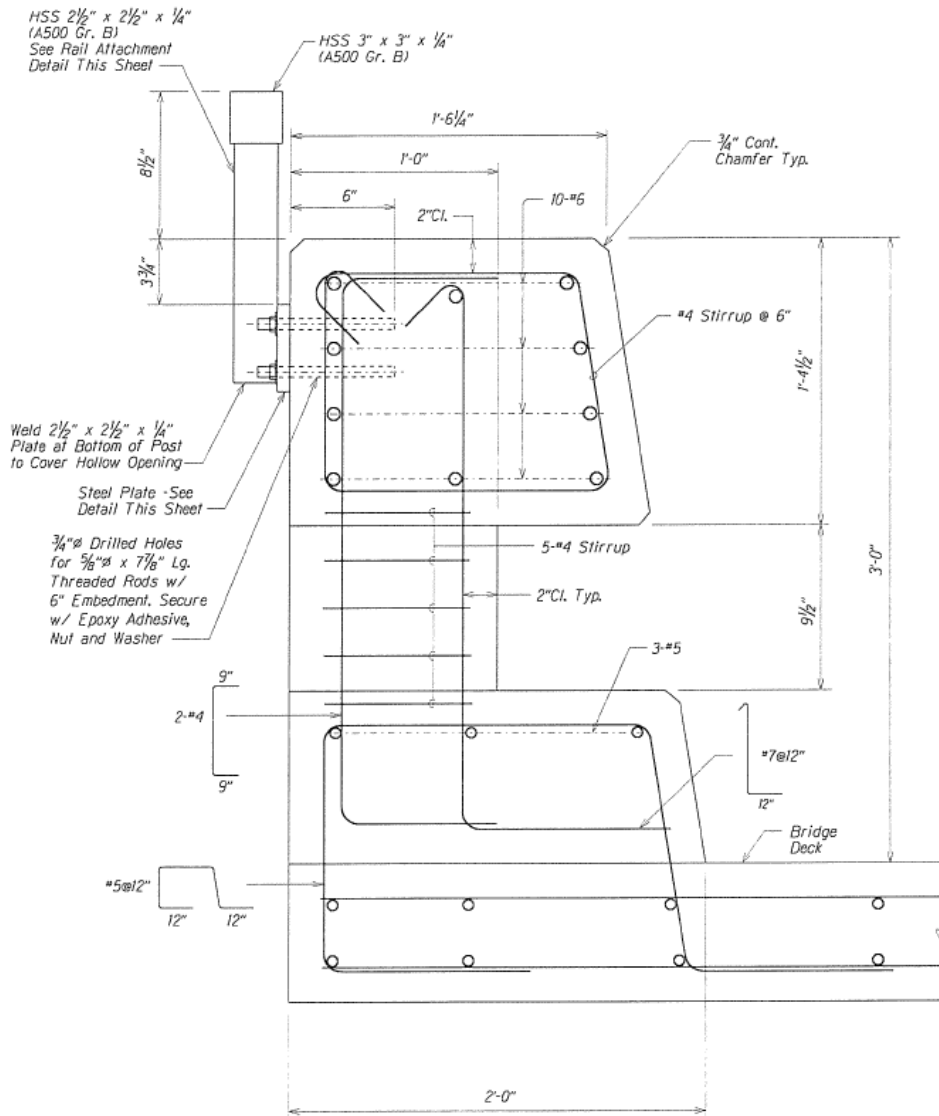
Hawaii Modified Natchez Trace Bridge Rail Design Details
